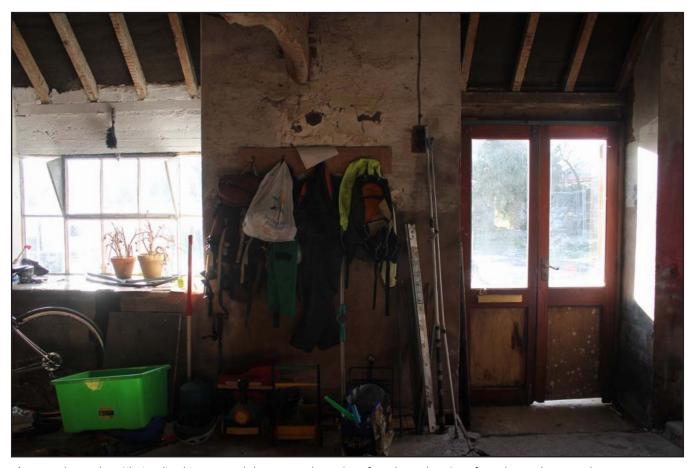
Plas Yn Llan, Cilcain, Flintshire. Internal shot - example section of southern elevation - from the north - 1m scale
